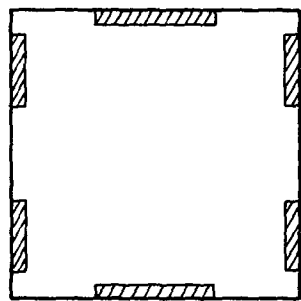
SYMMETRICAL RECTANGULAR PLAN
